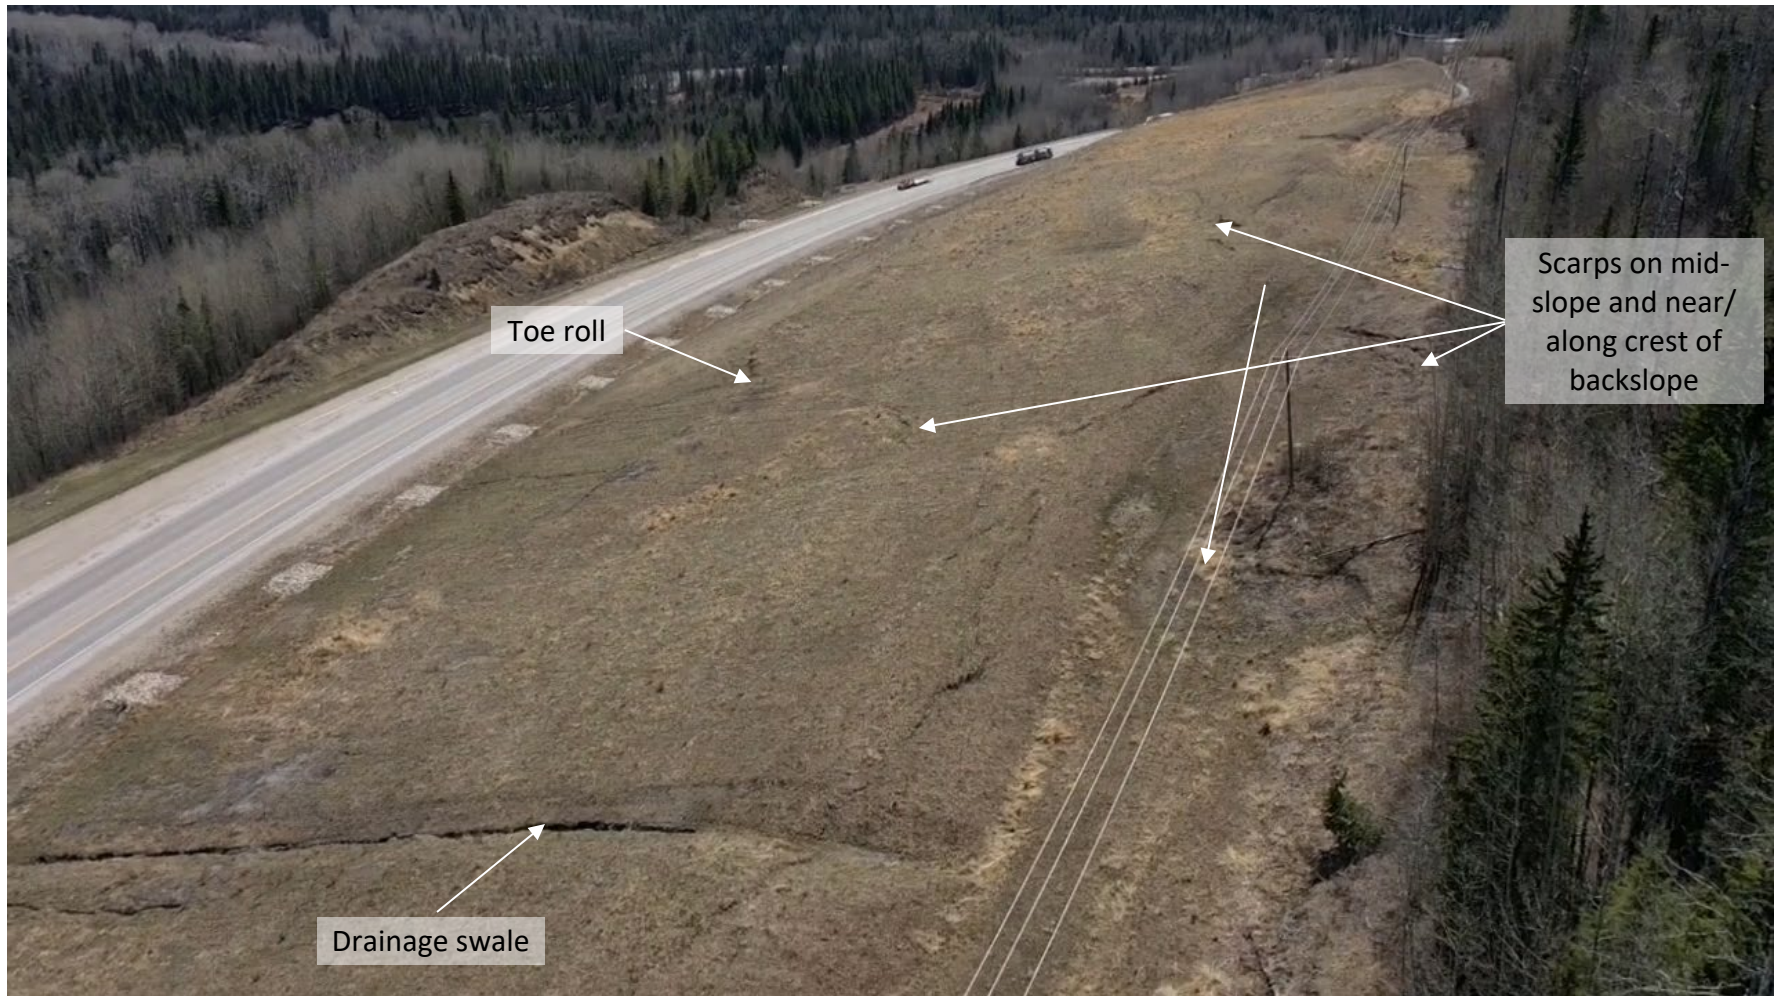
South end of GP044 site along backslope on west side of Hwy 40:40. Note rill and small gully erosion on backslope. Photo taken with UAV on May 9, 2024, facing west.
